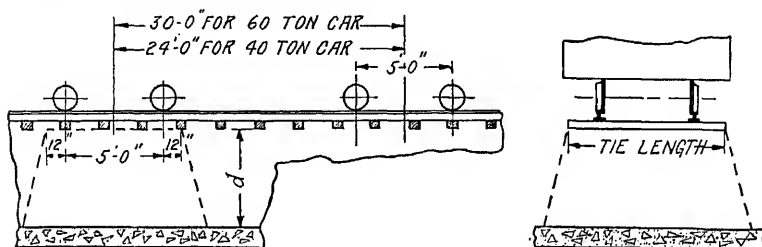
Load Diagram for 60-Ton and 40-Ton Electric Cars
